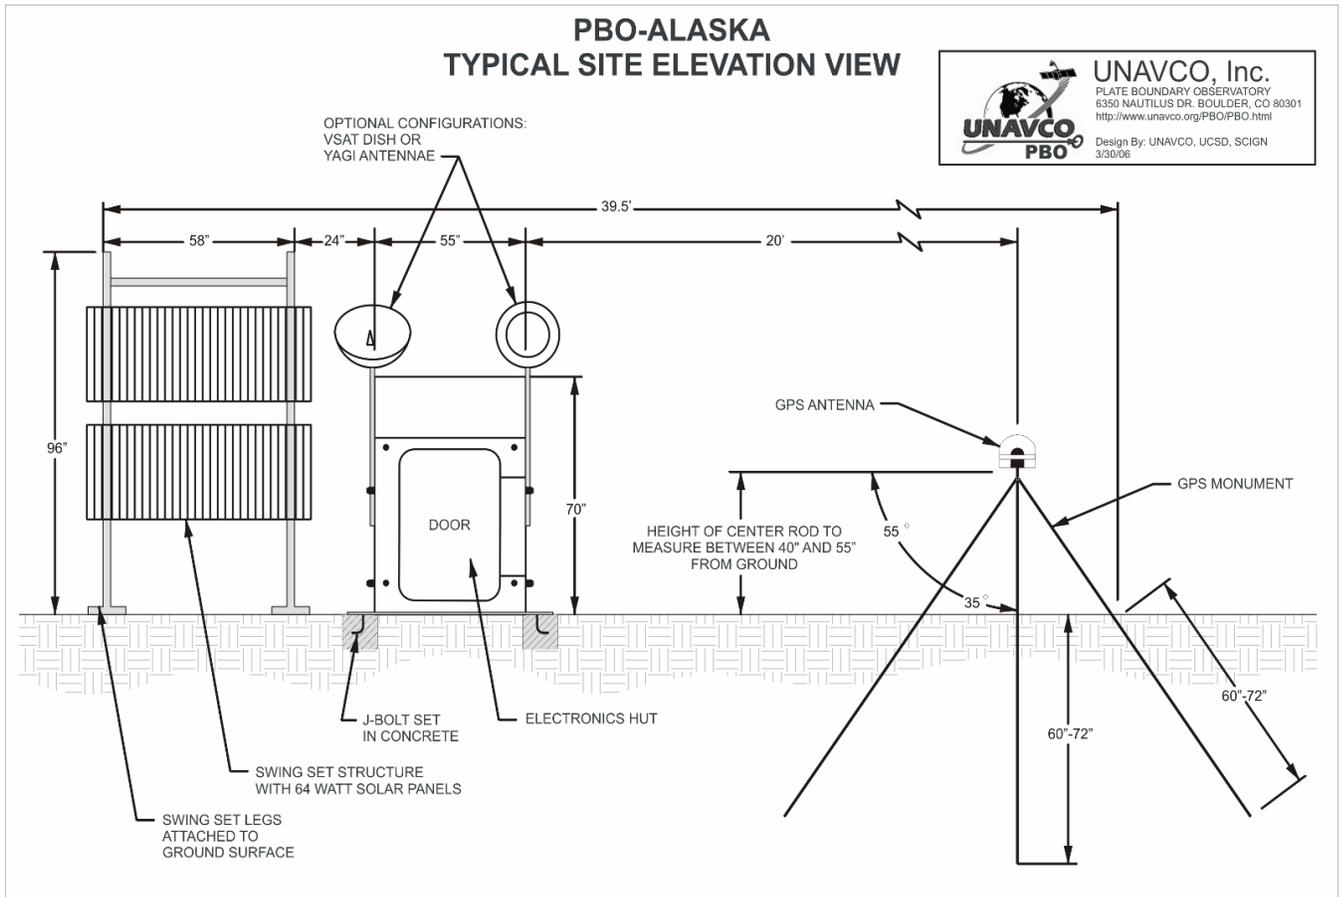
Typical drawing of a short drill-braced monument, equipment enclosure and solar panel support structure
